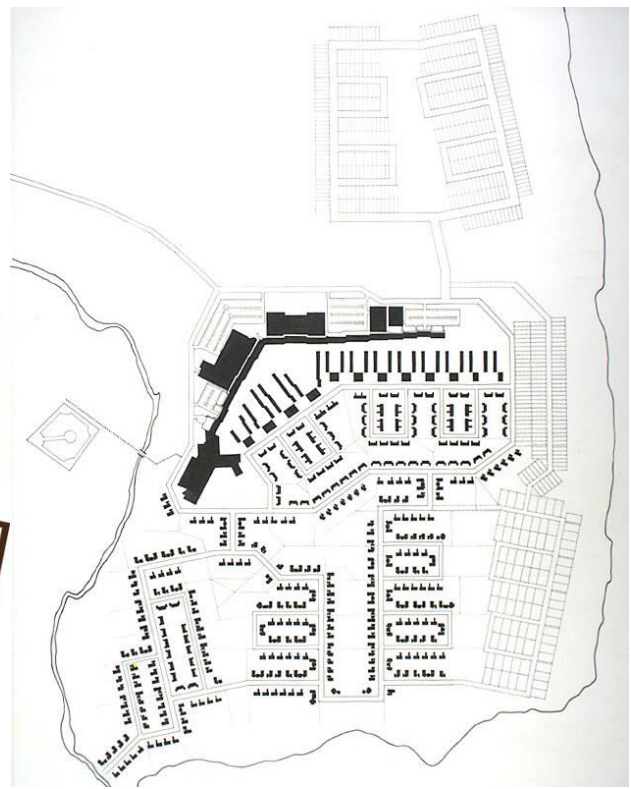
Townsite of Fermont, Master Plan (Drawing by A. Sheppard, 1970)
